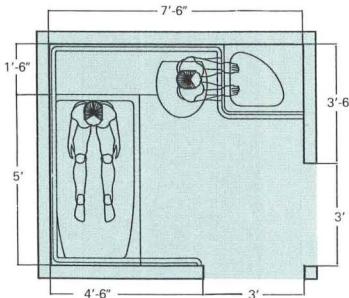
, BATHROOM PLAN, EXPERIMENTAL BATHROOM WITH CONVENTIONAL BATHTUB
